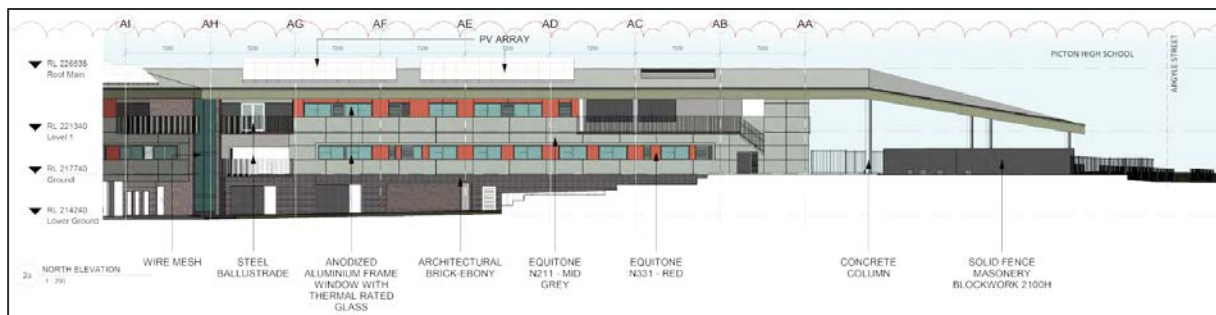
| Proposed northern elevation of main building (western side) (source: Section 4.55 Modification Application, 2019)
